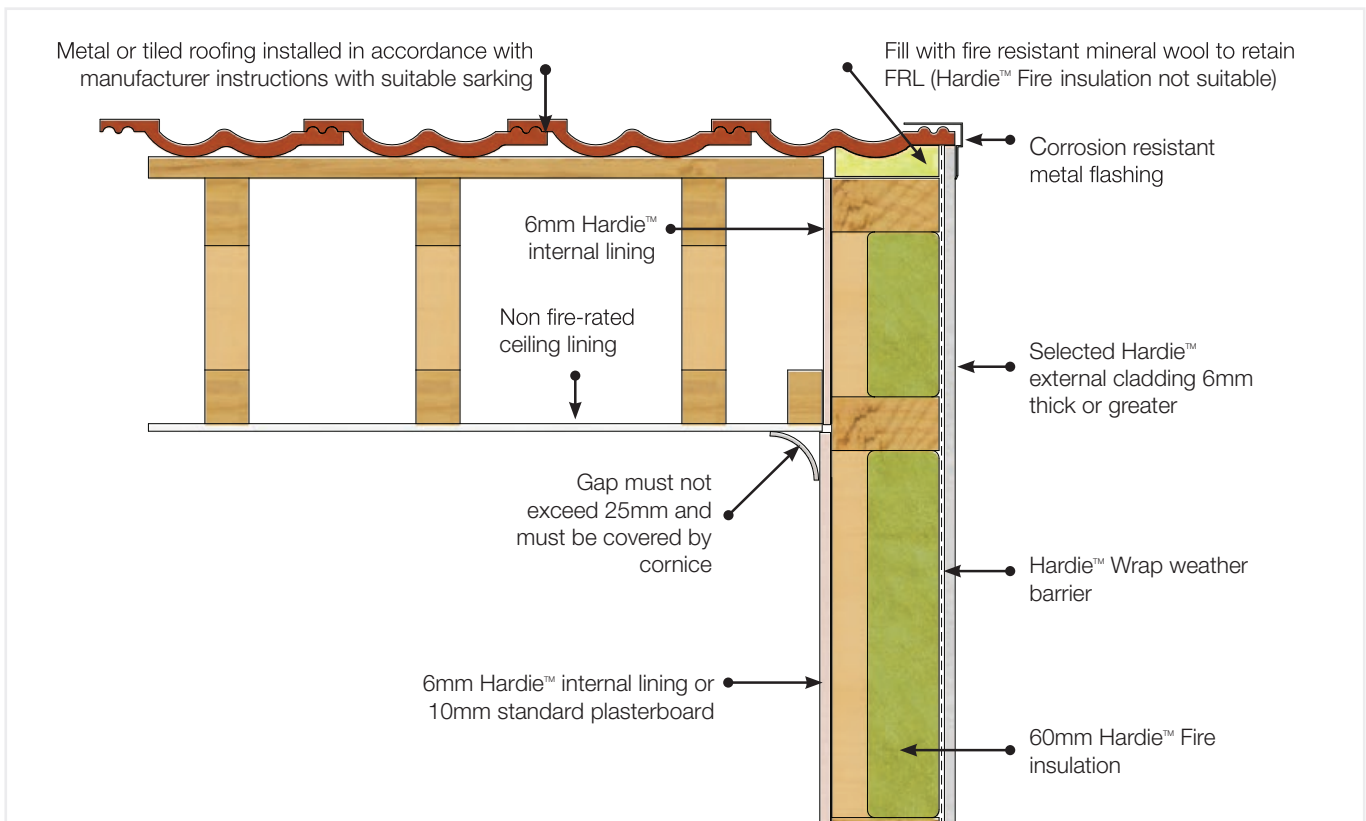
EXTERNAL BOUNDARY WALL TO PARAPET ROOF WITH PARALLEL ROOF TRUSSES
